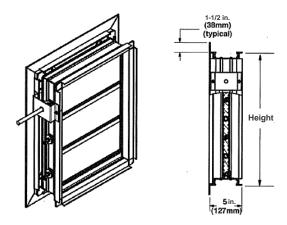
Flange Frame Detail (Width and Height are O.D. Frame)
